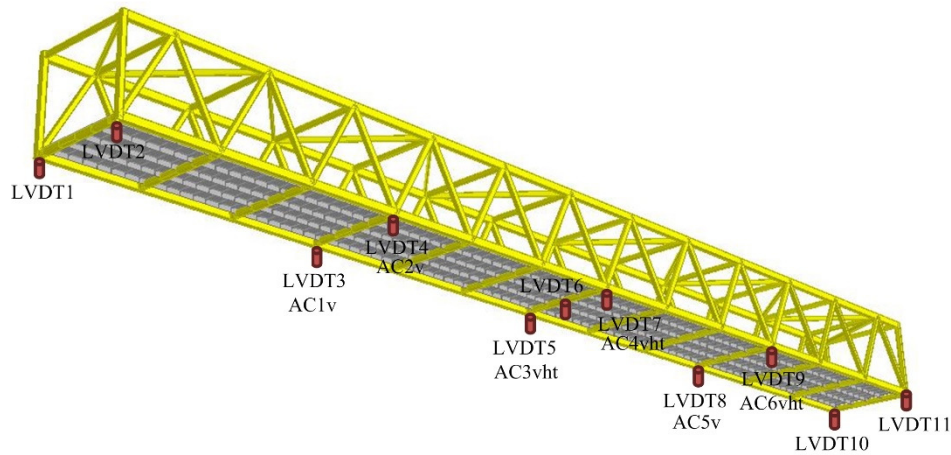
Typical instrumentation of the footbridge deck: LVDT – vertical linear variable differential transducers; AC – accelerometers in vertical (v) and horizontal transverse (ht) directions (horizontal transducers and strain gauges are not shown)
